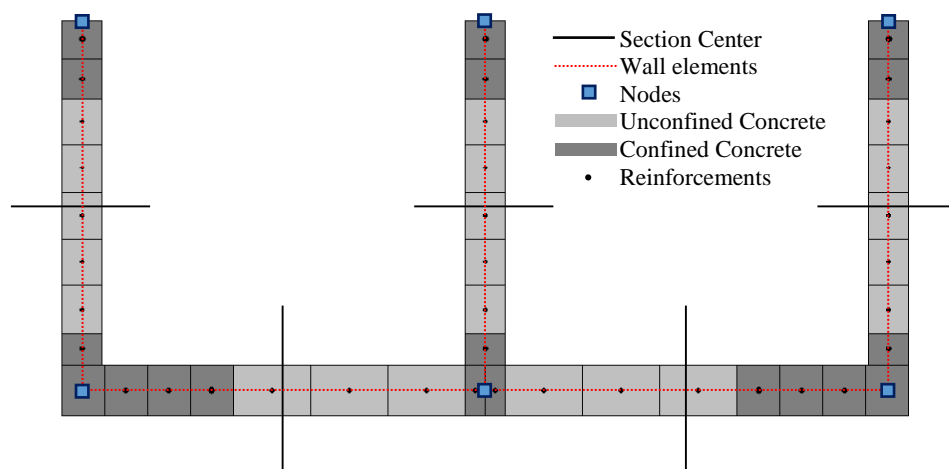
Fiber modeling of a structural wall in Perform3D.
